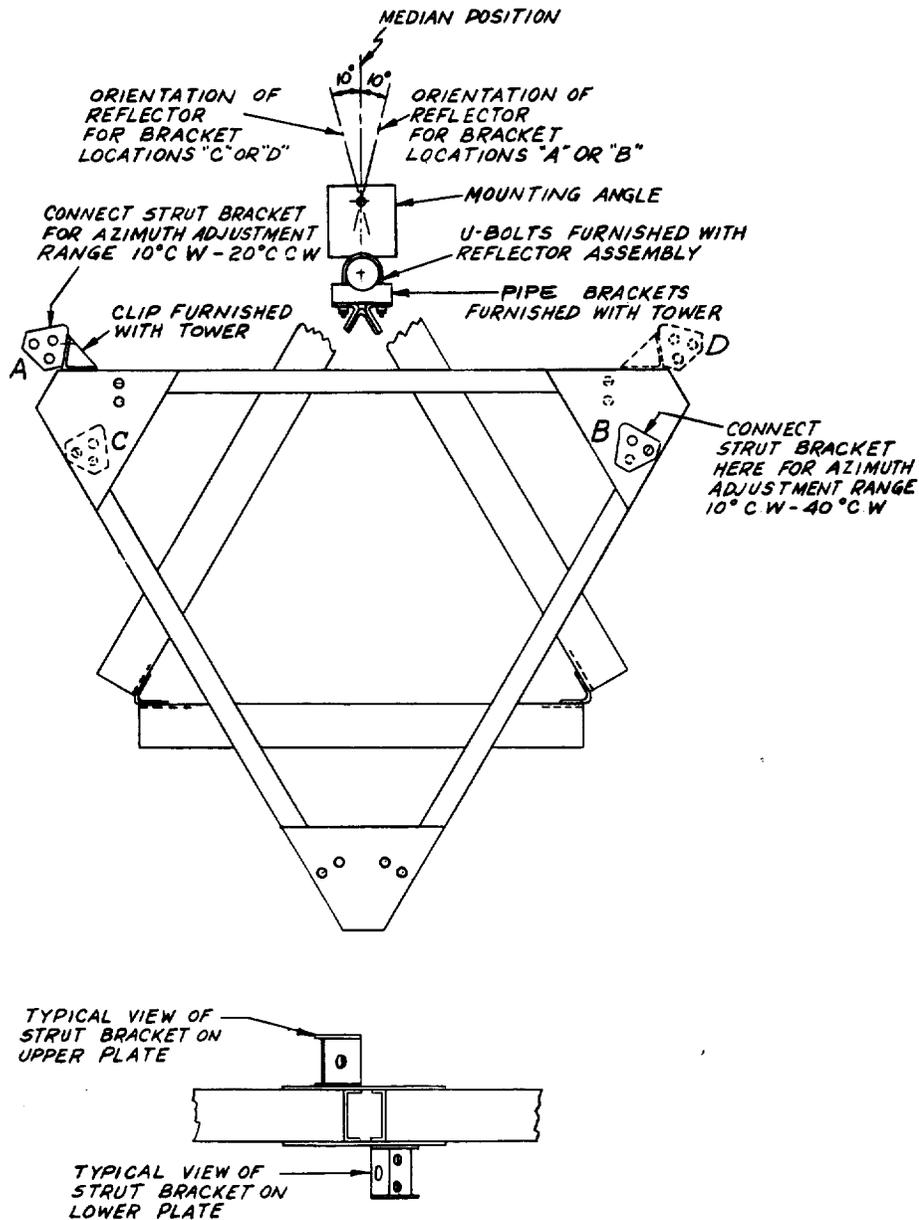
Mount for KS-16320 Passive Reflector on AT-7728 B Guyed Tower, AT-8009 C Guyed Tower, and AT-8013 C Self-Supporting Tower
